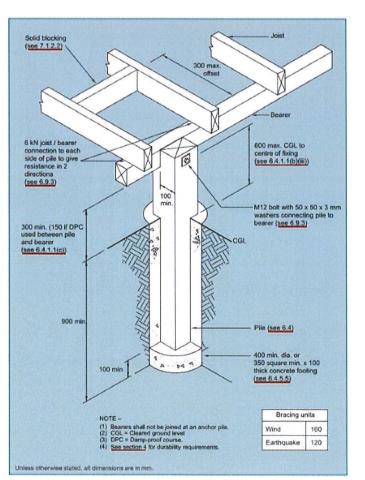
Anchor pile directly connected to bearer only (see 6.9)
